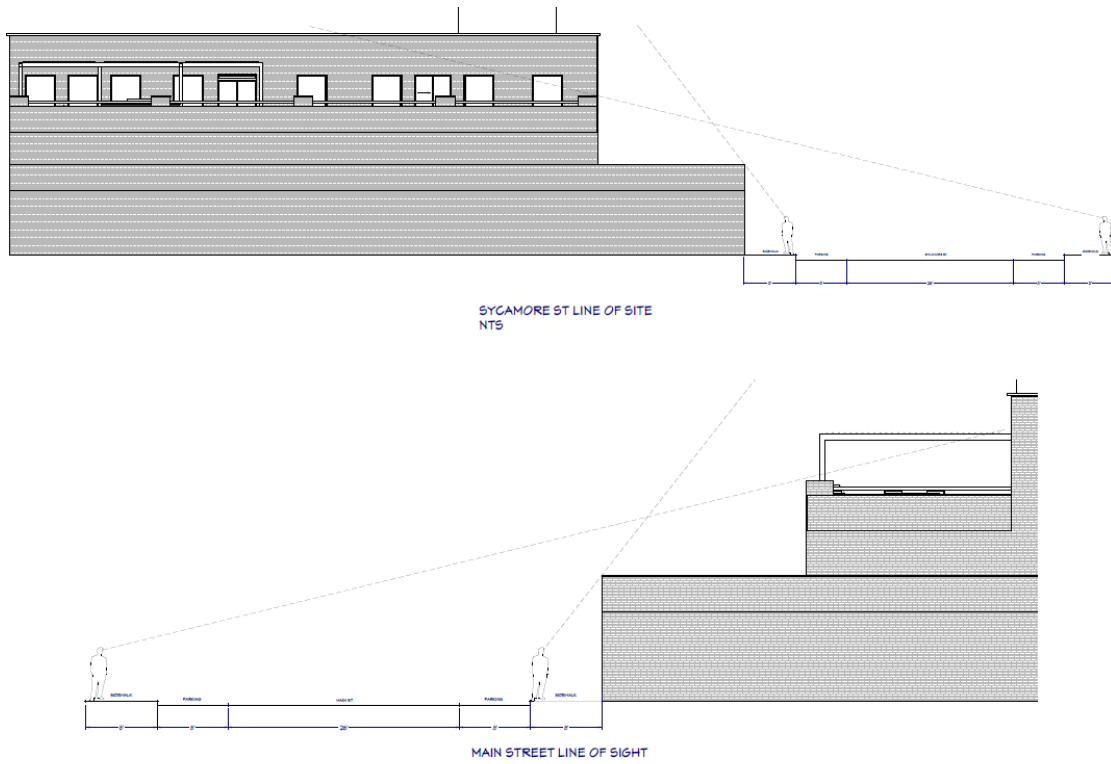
Site lines of proposed addition, 2329 W. Main St.
